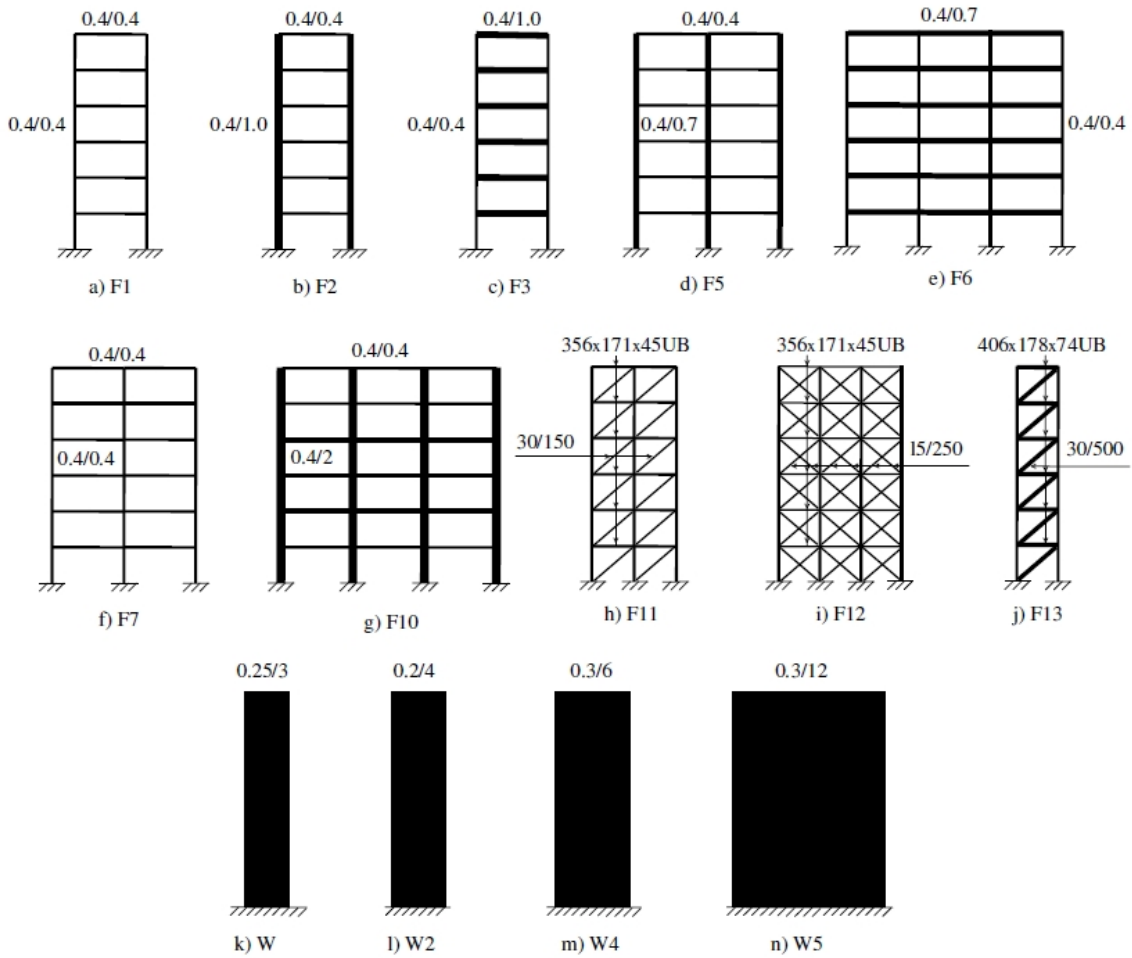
Structures for the accuracy analysis. a)-g): reinforced concrete frames, h)-j): steel frames, k)-n): reinforced concrete shear walls.
